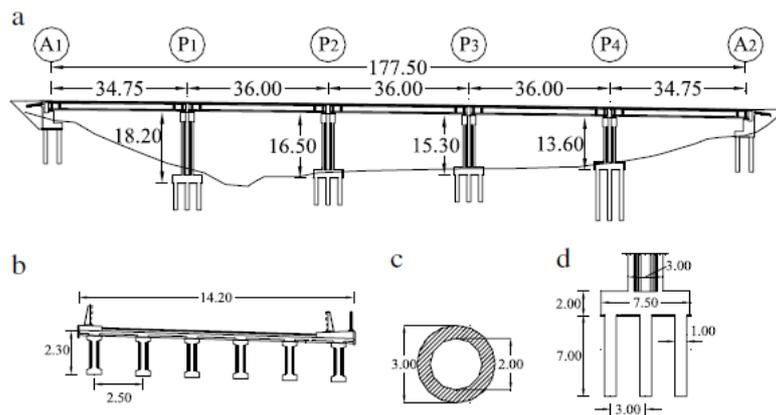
(a) Longitudinal section of the simply supported “reference” bridge (b) Deck Cross-section (c) Pier Cross-section (d) Foundation
